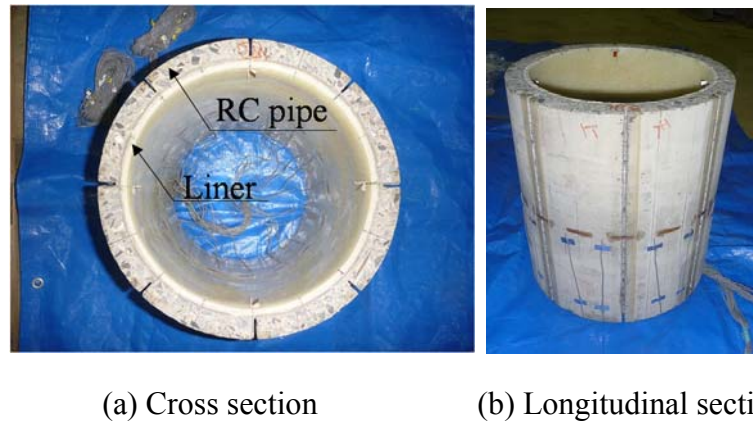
Pipe specimen with the reinforcing steel bars cut off.
